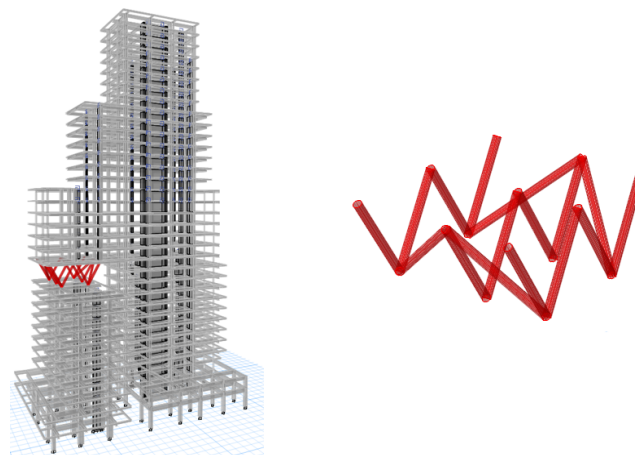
3D view of the ETABS model (left) and 3D view of the connecting steel truss (right).
